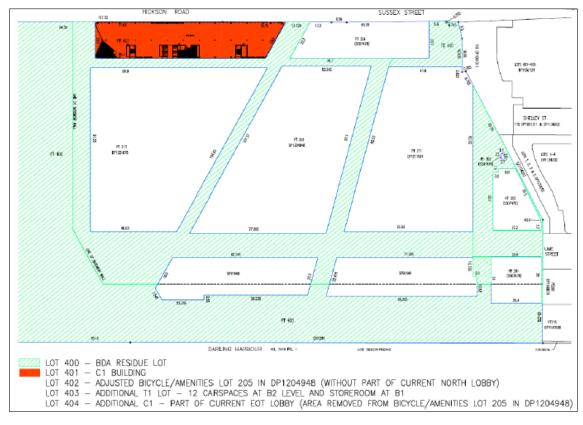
| Level 2 and above (north) showing proposed Lot 401 (red shading) and proposed Lot 400 (green hatching) (Source: Applicant)
